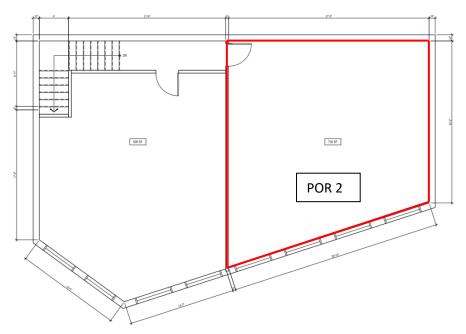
Layout of the second floor indicating POR 2 to Beechwood and furthest from Chapleau
